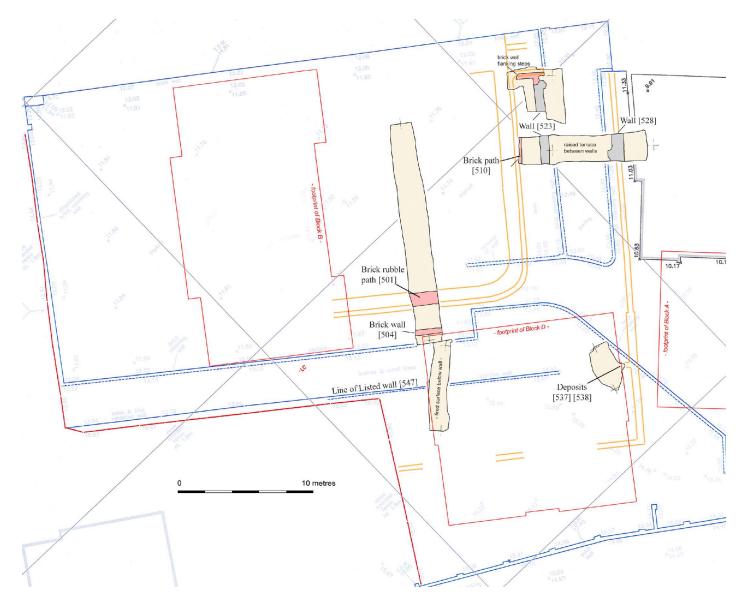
Plan showing the main structural features in relation to the OS 1864 plan (in orange).
